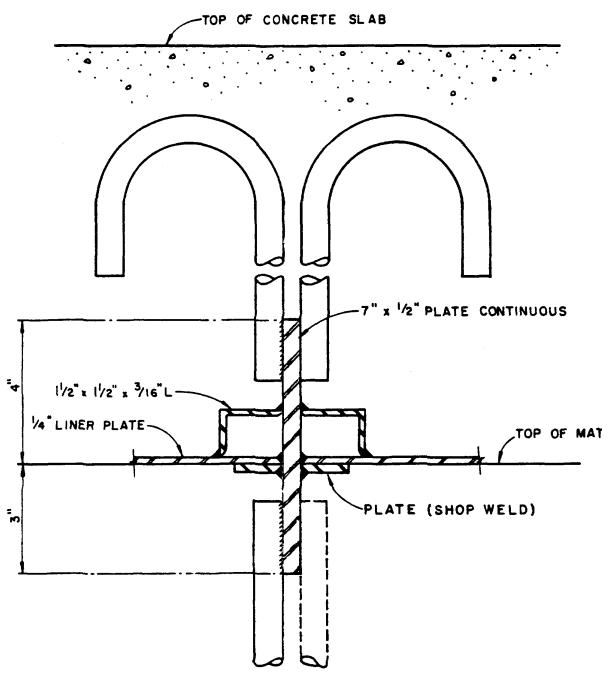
SECTION: TYPICAL BRIDGING BAR
